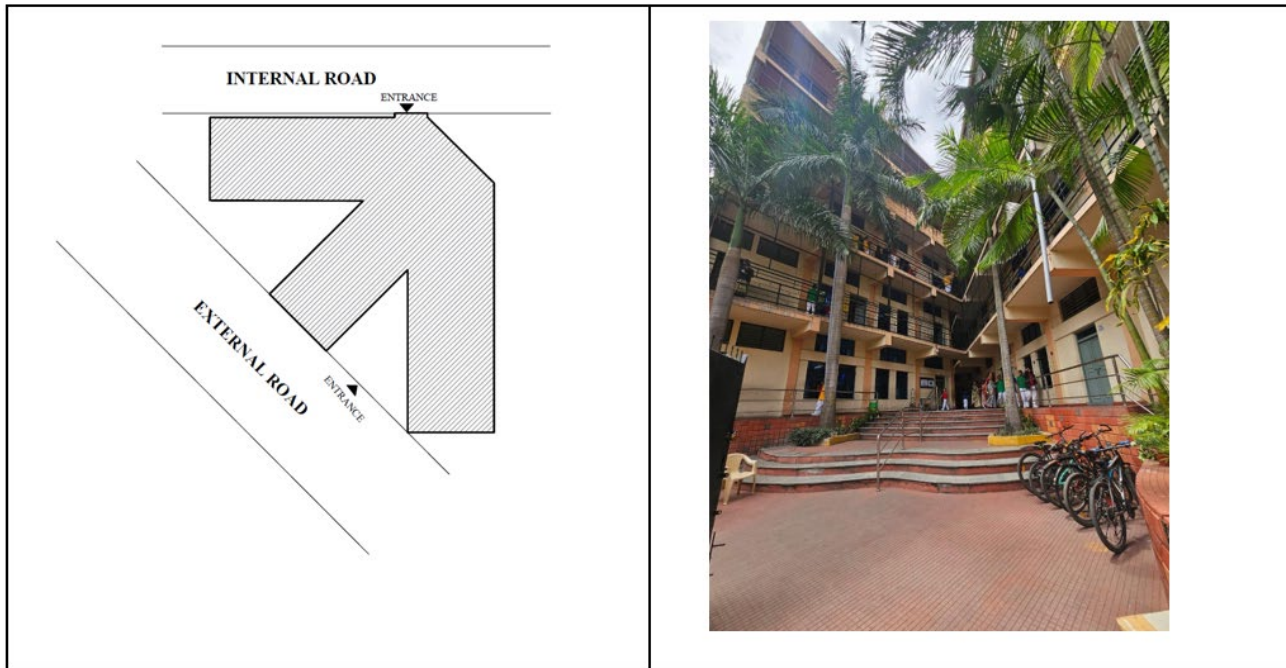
Plan and View of the Surveyed Reference School Building. (a) Site Plan; (b) Courtyard View of the School
